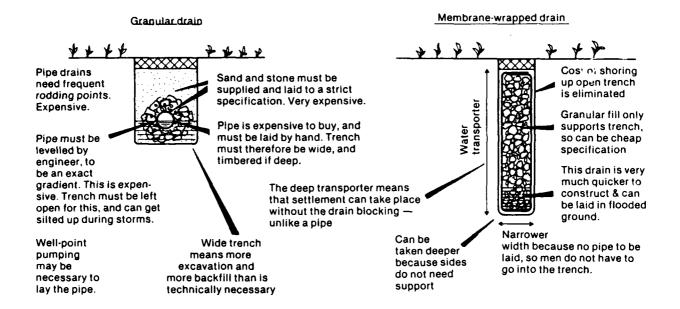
Conventional granular pipe trench drain and membrane-wrapped trench drain. (after Rankilor, 1981)
